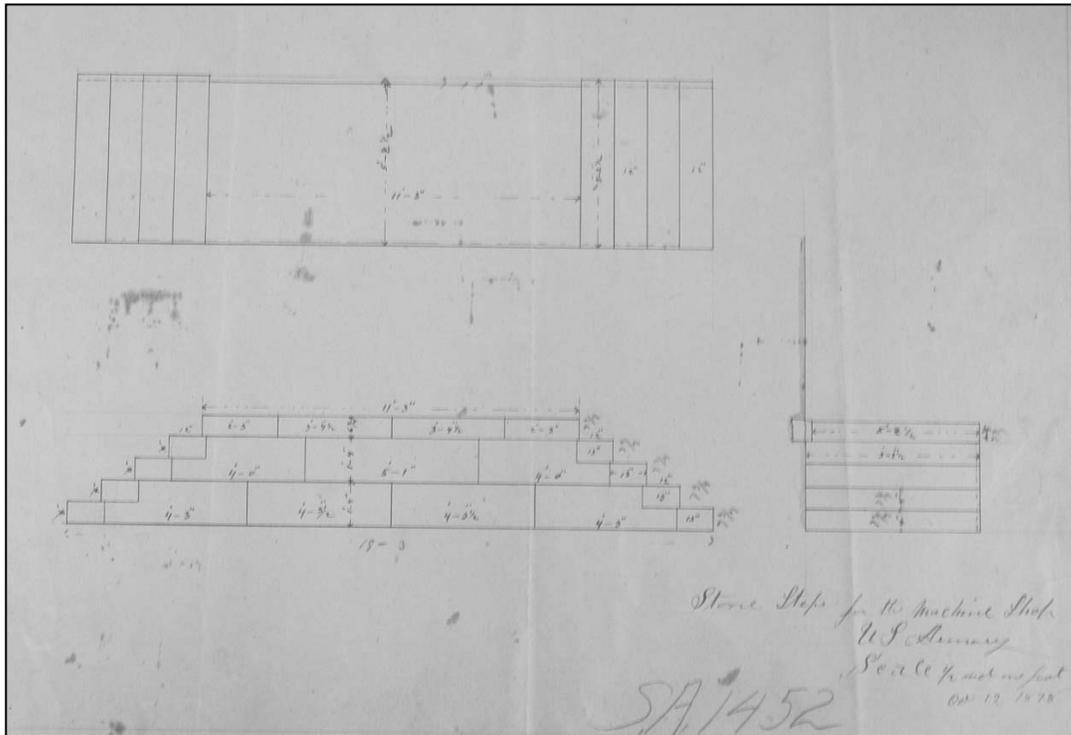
"Stone steps for the Machine Shop, U.S. Armory, Oct. 12, 1878." Steps designed for the south elevation entrances of Building 27.
